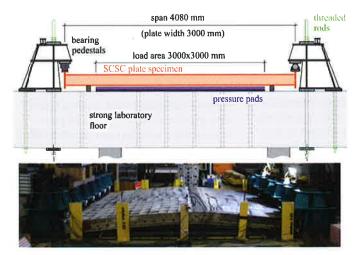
Test setup for static load-carrying investigation with type 1 specimen installed. Longitudinal section and view of testing area during experimental procedure at maximum test load. Institute of Structural Engineering, TU Wien
